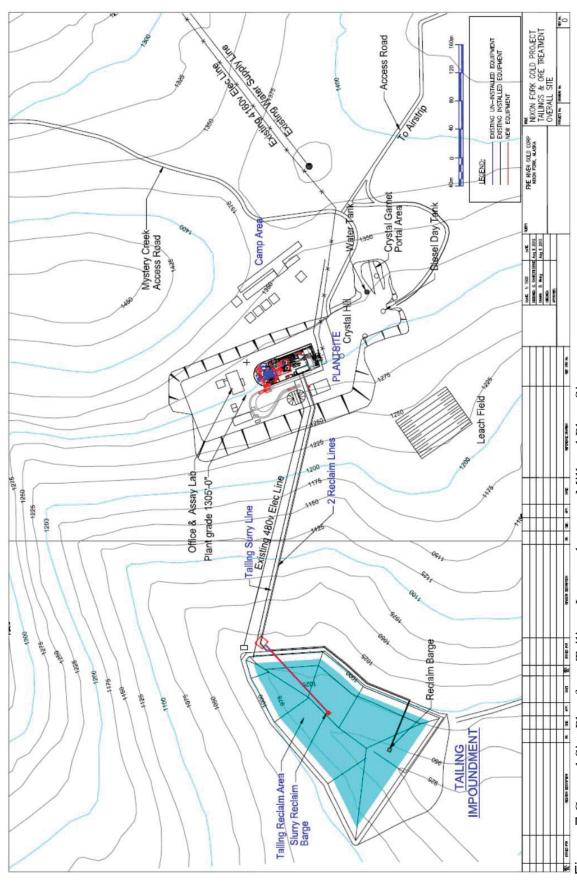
General Site Plan from Tailings Impoundment to Mill and Plant Site.
